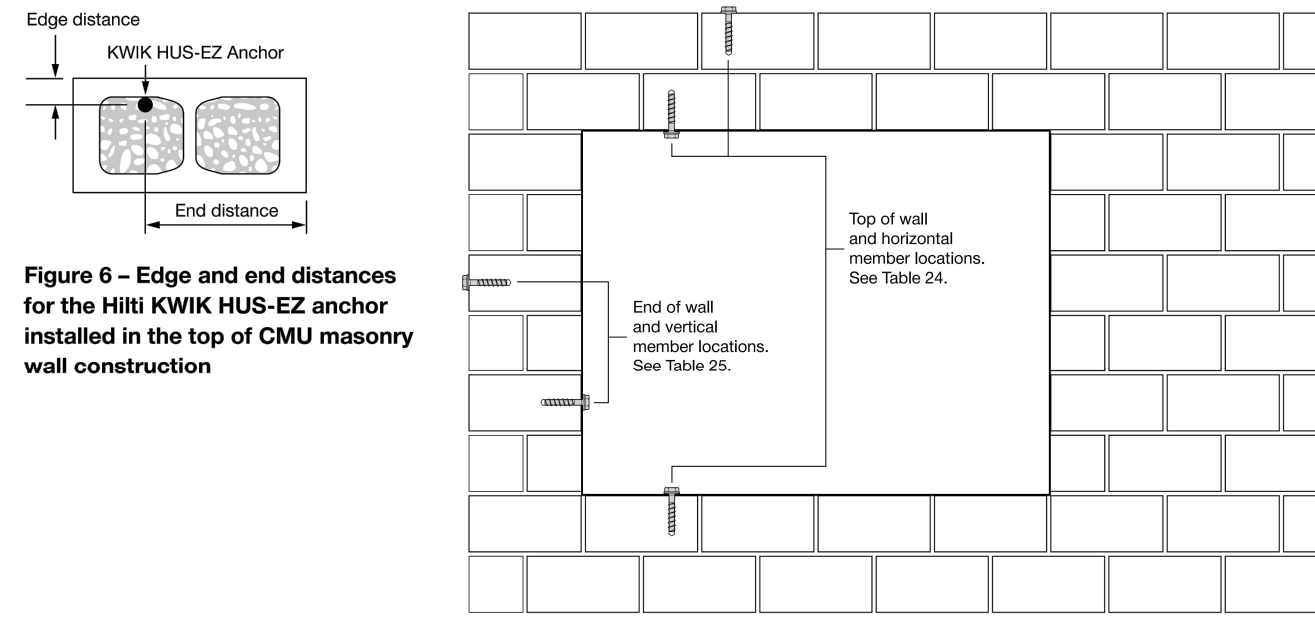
Edge and end distances for the Hilti KWIK HUS-EZ anchor installed in the top of CMU masonry wall construction
